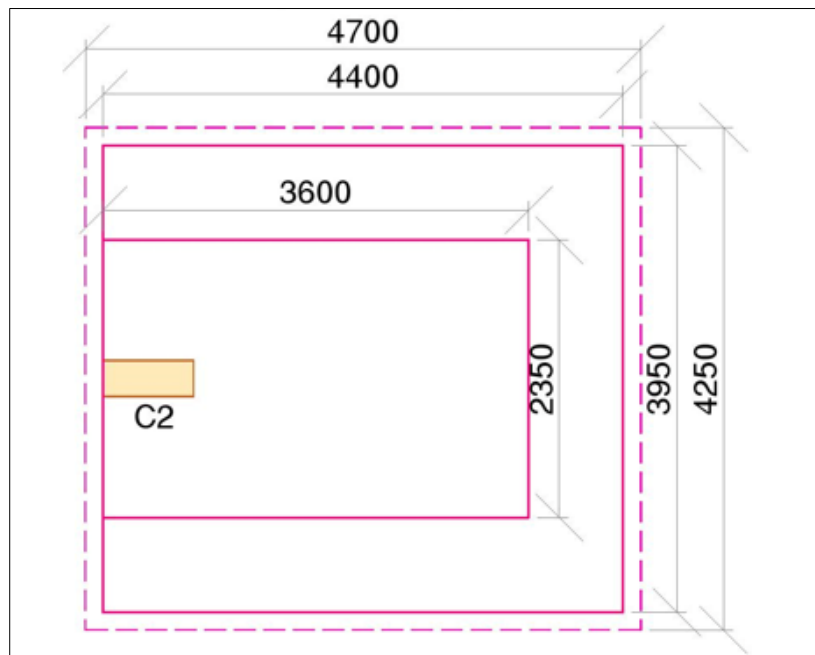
Section A-AFig 3: Detail of footing FC2, FC3, FC4
